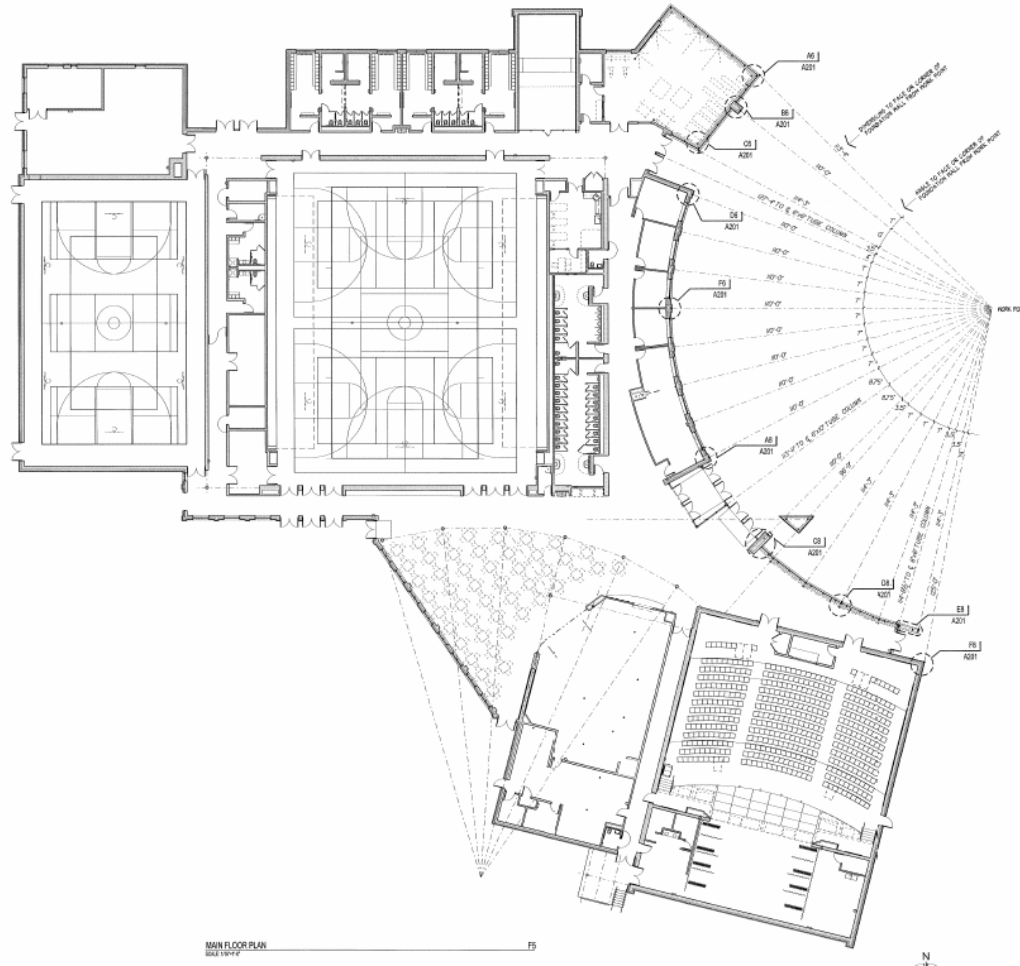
Eberly Campus Community Center Base Floor Plan
